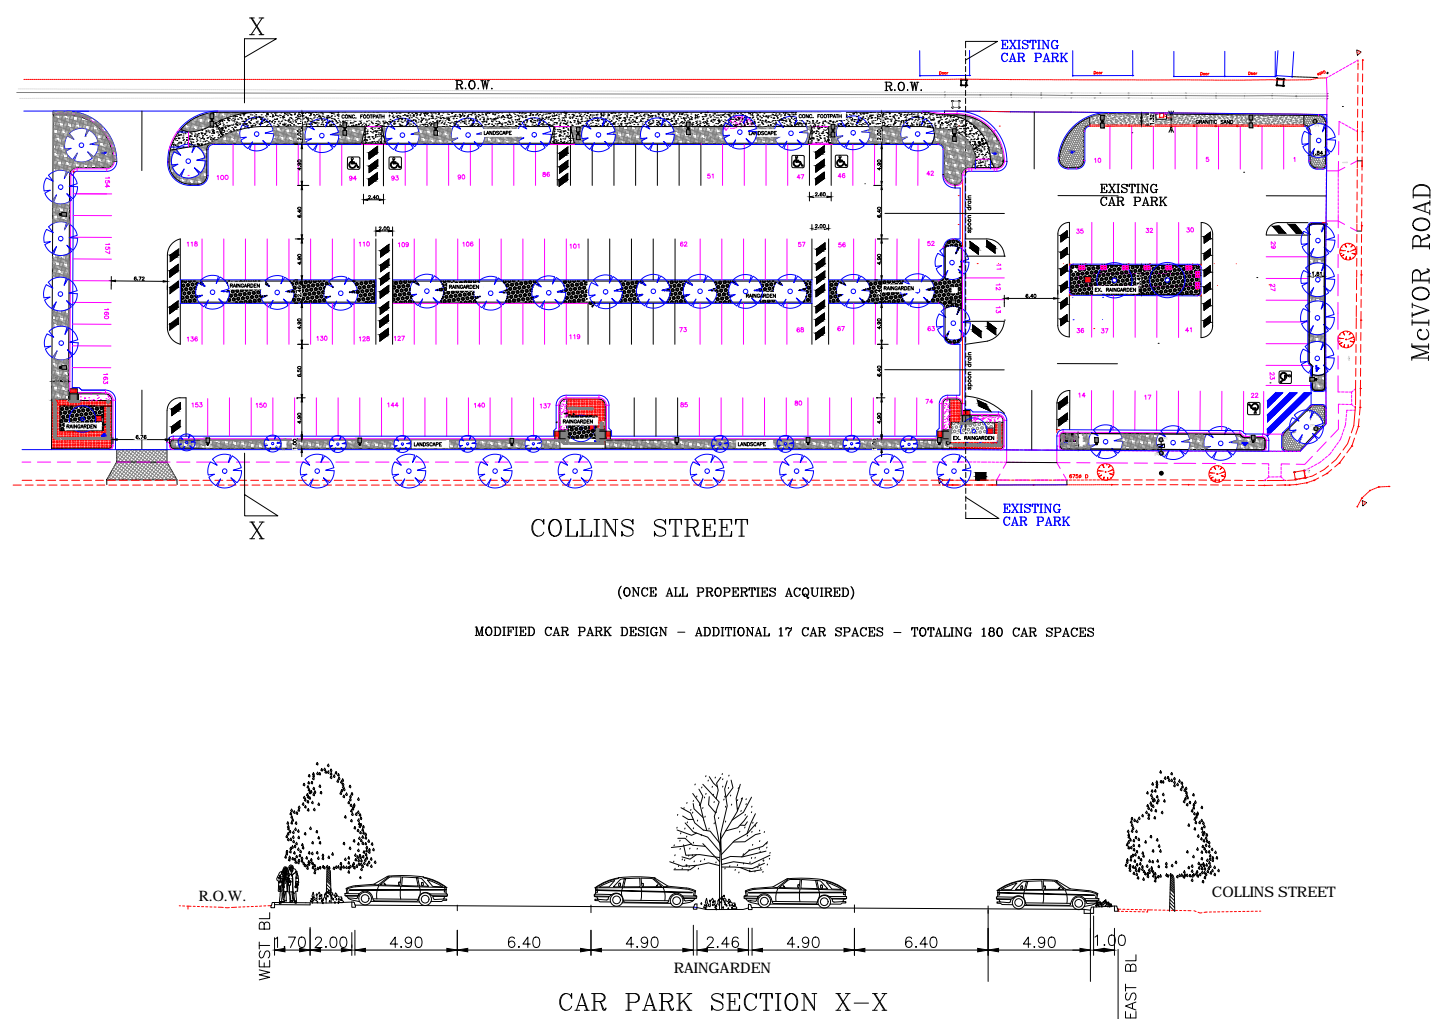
9-21 Collins Street St Albans Car Park Concept Plan (2019)
